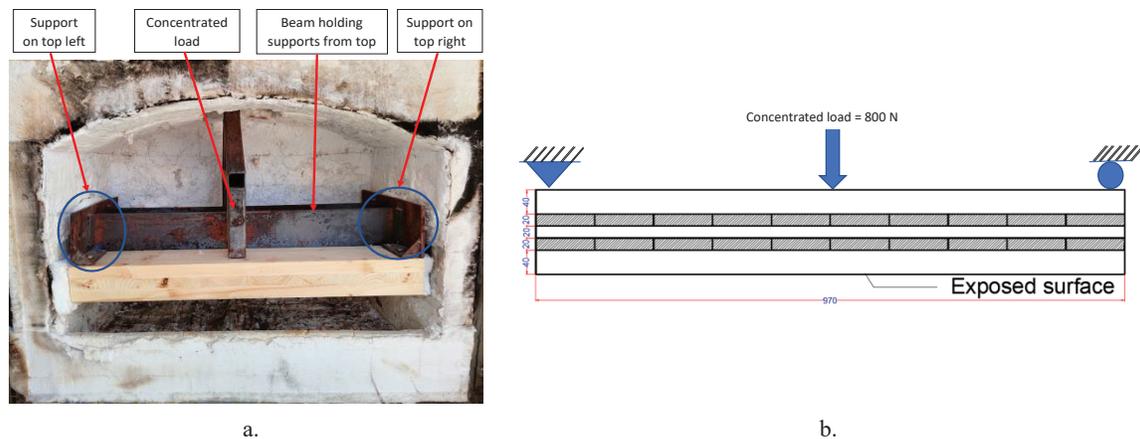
a. 3-layer CLT floor panel in the kiln b. Drawing and layout of 5-layer CLT panel
